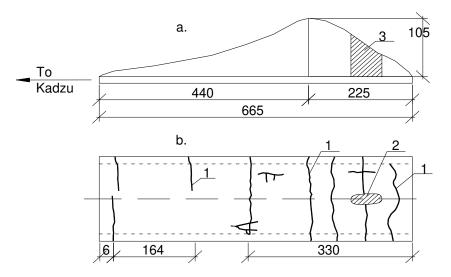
Kodzu tunnel - damage upon Kanto earthquake: a-longitudinal profile, b-damage to the vault and walls, 1-cracks, 2-vault collapses, 3-fallen area.
